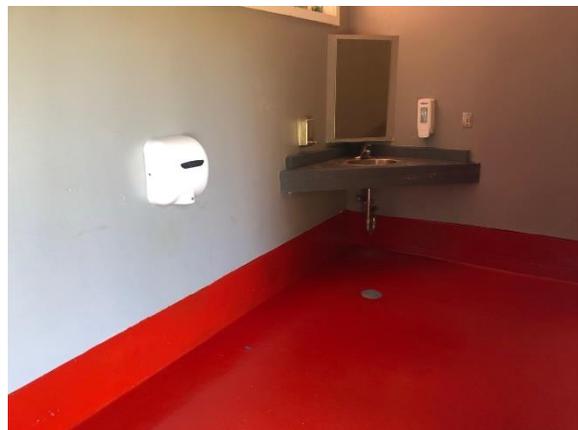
New Epoxy Floors at Parkhill Park Bathrooms
